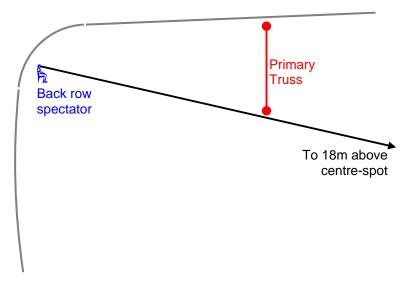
Elevation view of structure showing Primary (red) truss location defined by offset to structure and sightline surface.
